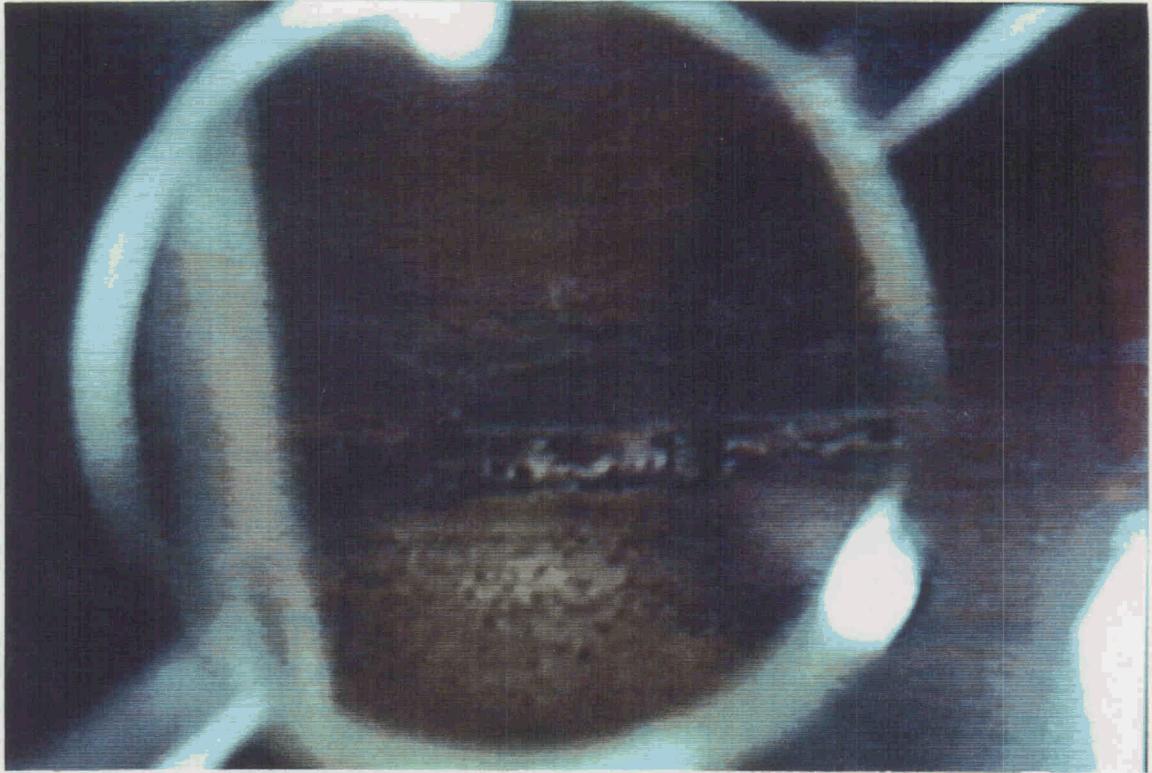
Welded seam in roof corner of duct with caked dirt on wall.
